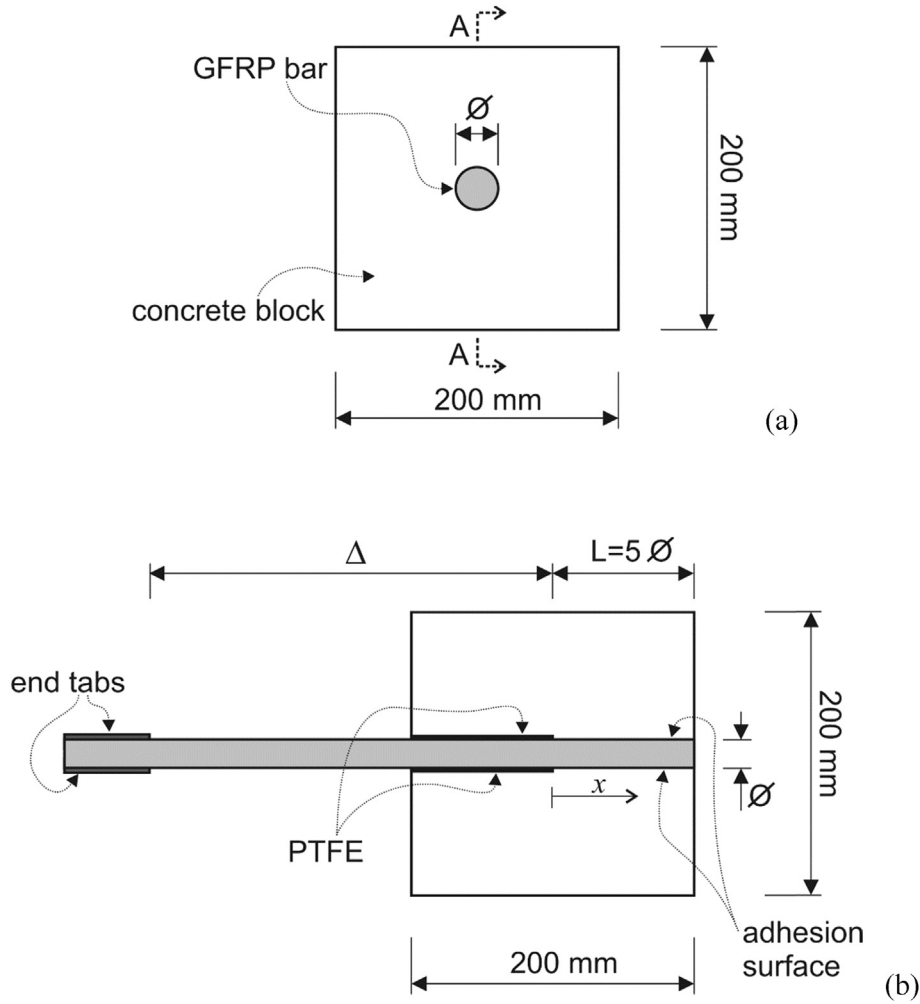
Pull-out specimen geometry: (a) top view; (b) longitudinal section A–A.
